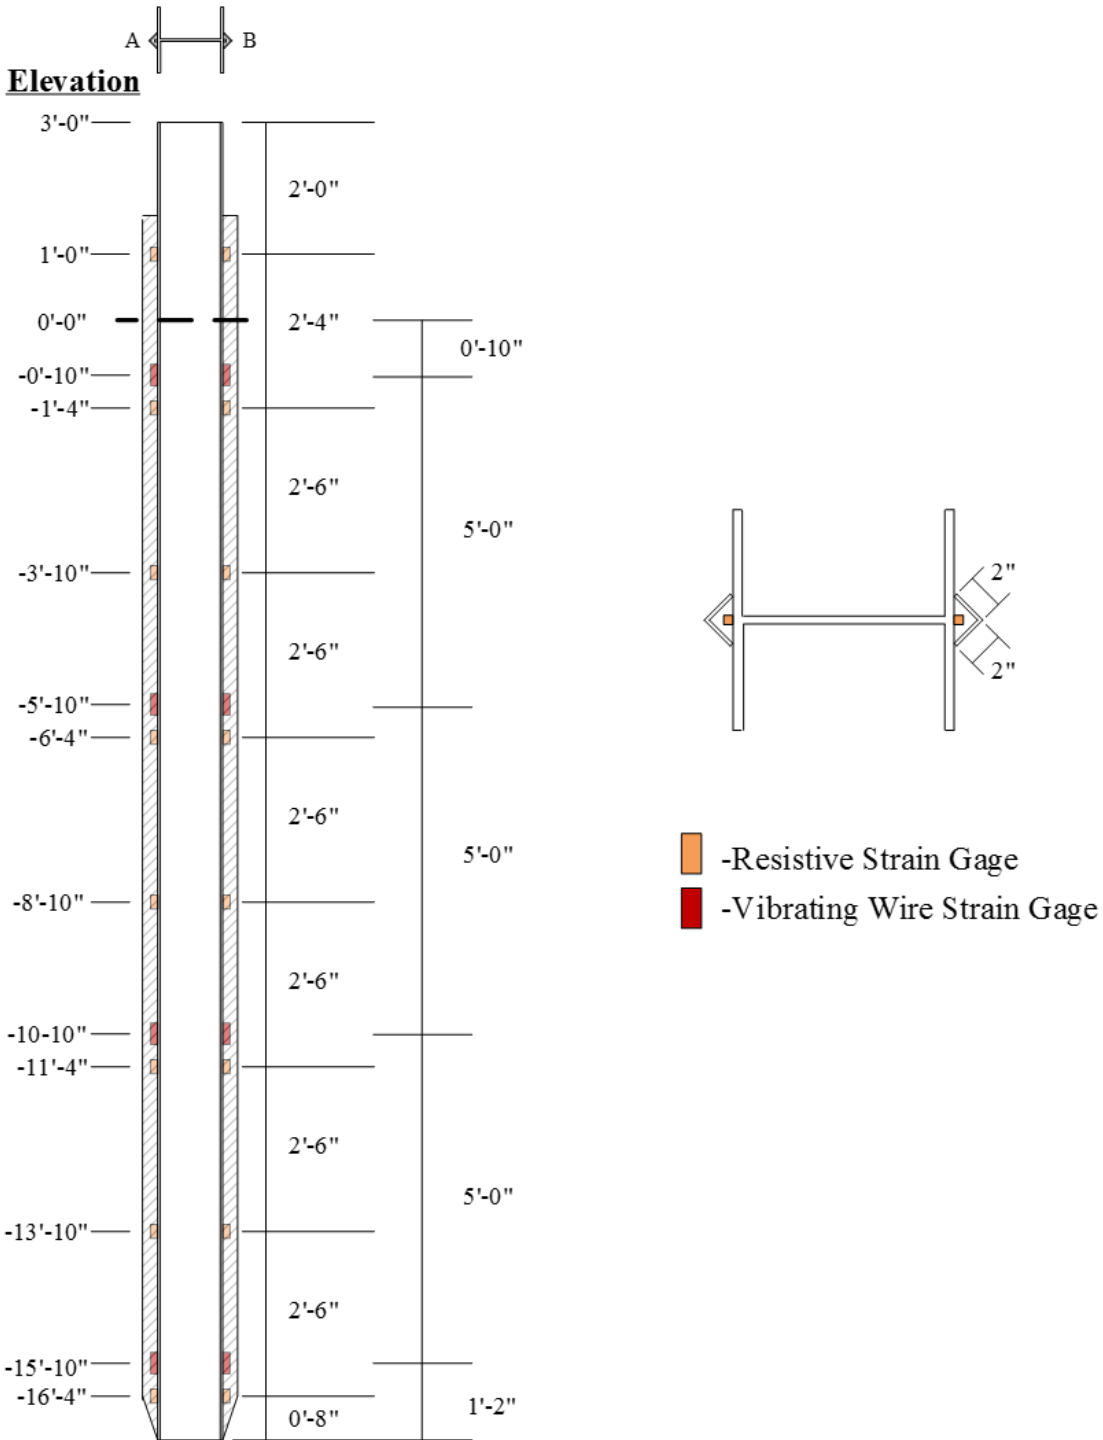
Layout of instrumentation for H-pile tested at field site.
